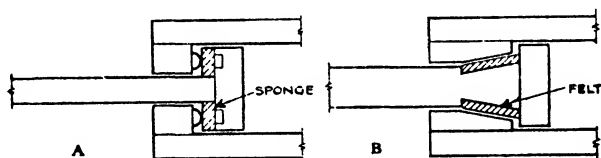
SEAL TO TRAILING EDGE OF SLIDING DOOR
